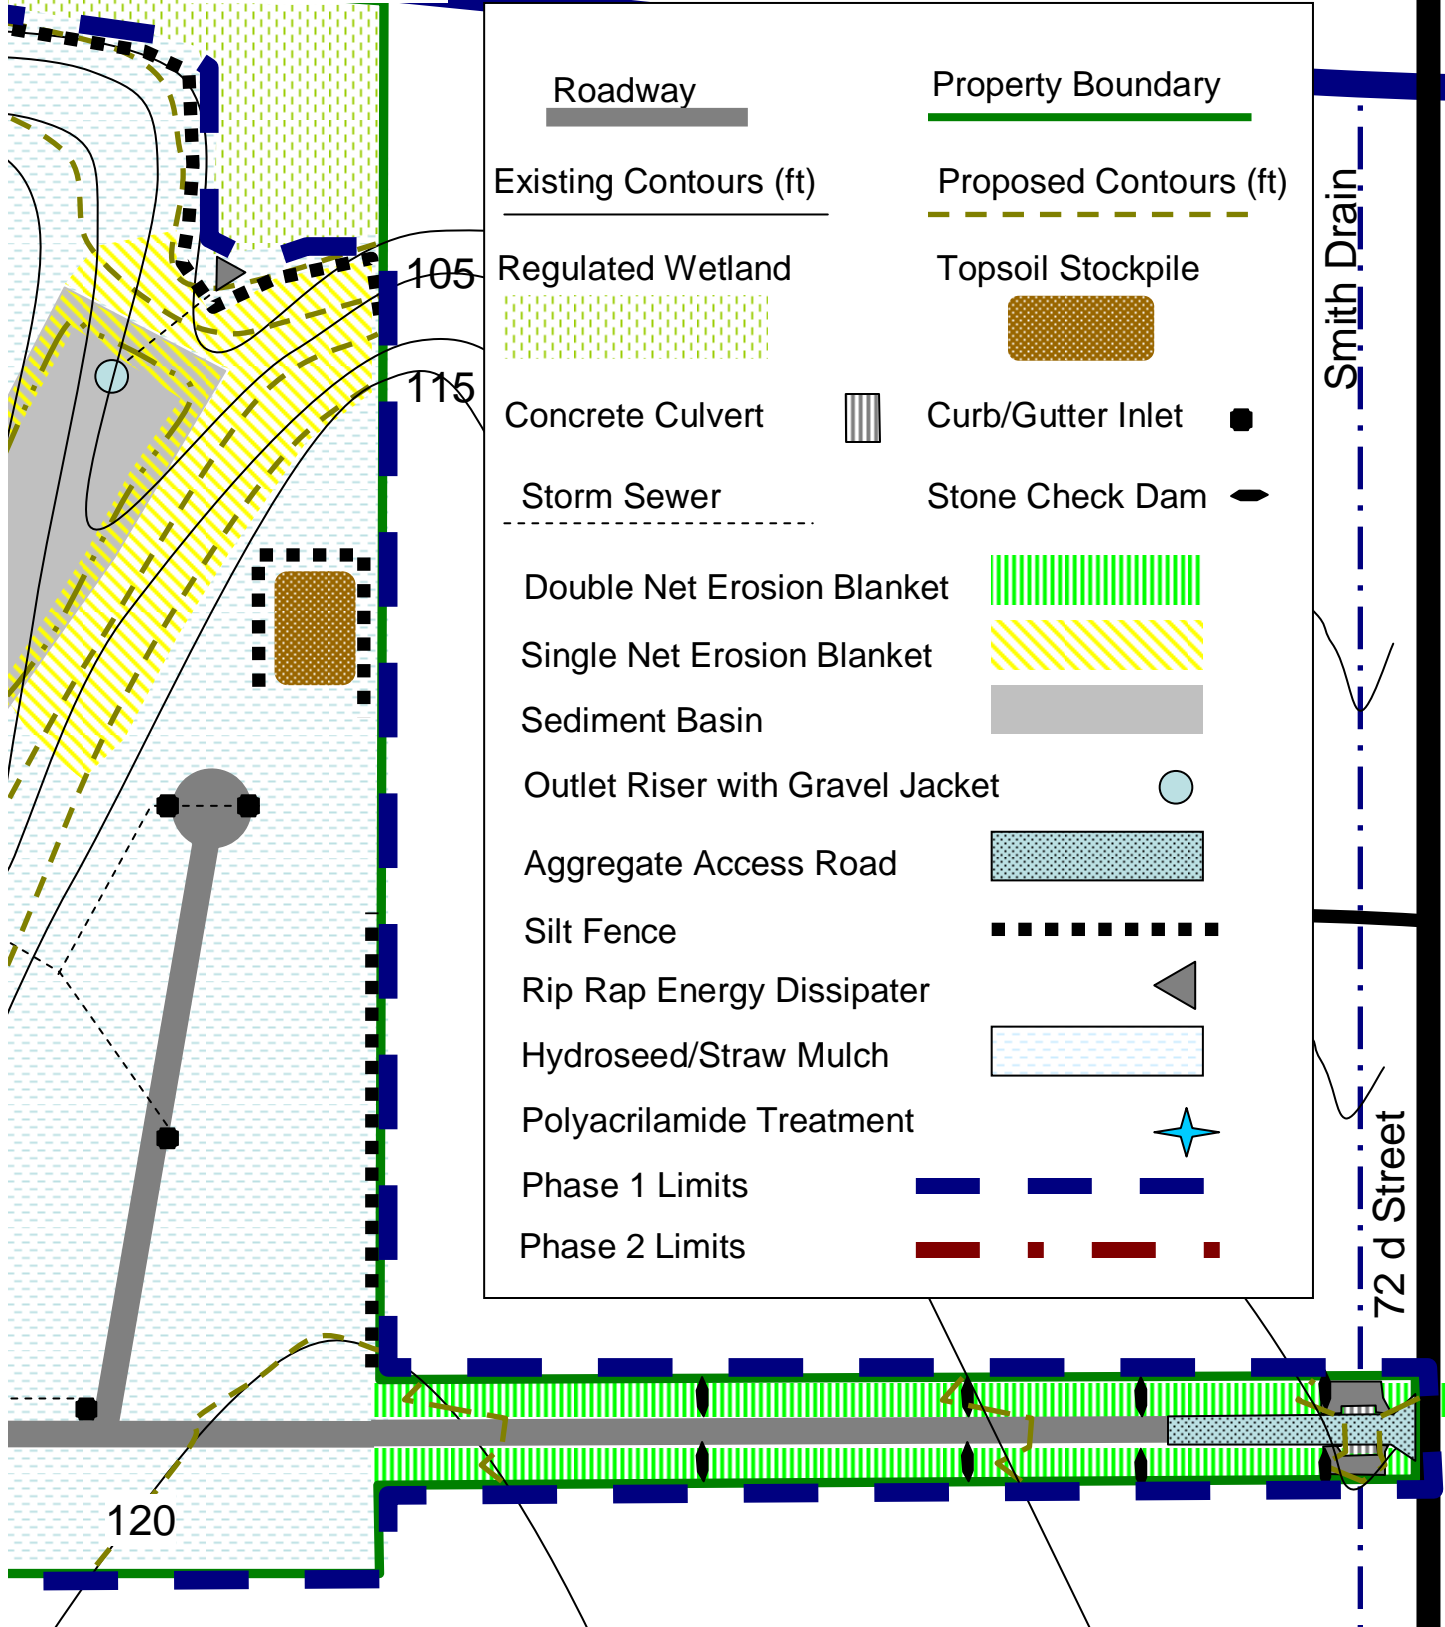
SESC Plan – SESC measures and Drainage Information
